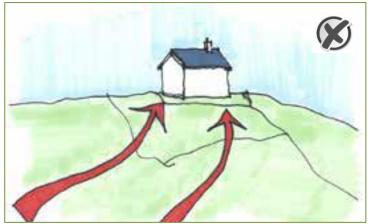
Avoid Building on elevated or unsheltered/exposed sites
